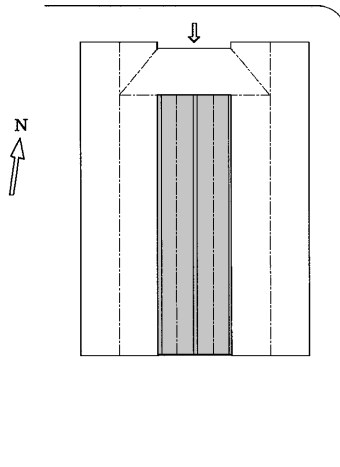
Layout plan, Piggvaren (Blomsterberg, 1993).
